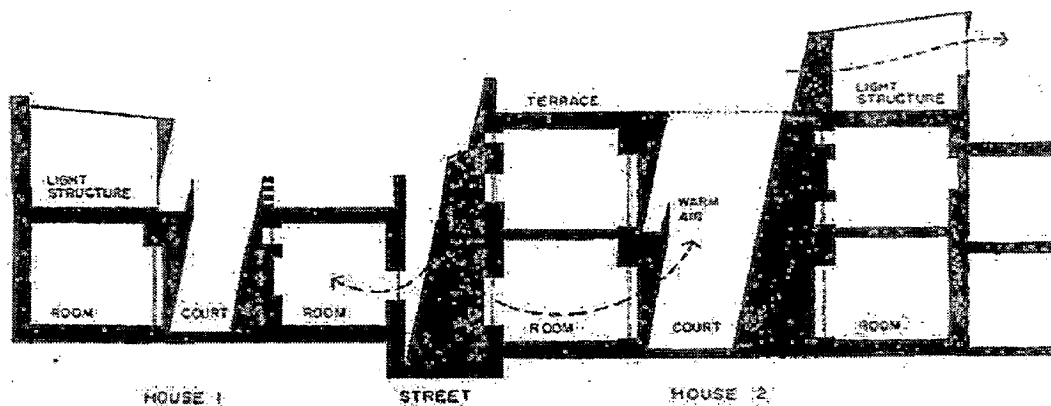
Section across houses in Rajasthan showing shading with courtyards.
